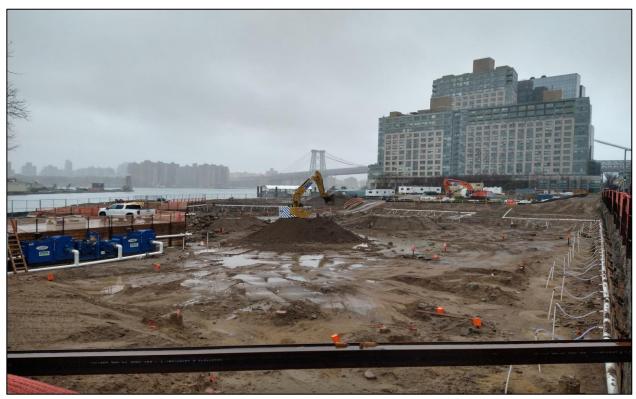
Spoil relocation looking northwest from Kent Avenue and Division Avenue.
